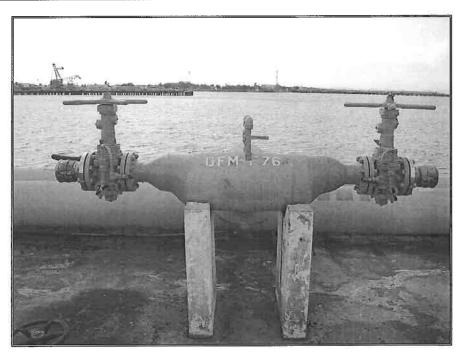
Test No. 1 Pier 1 Test Location
